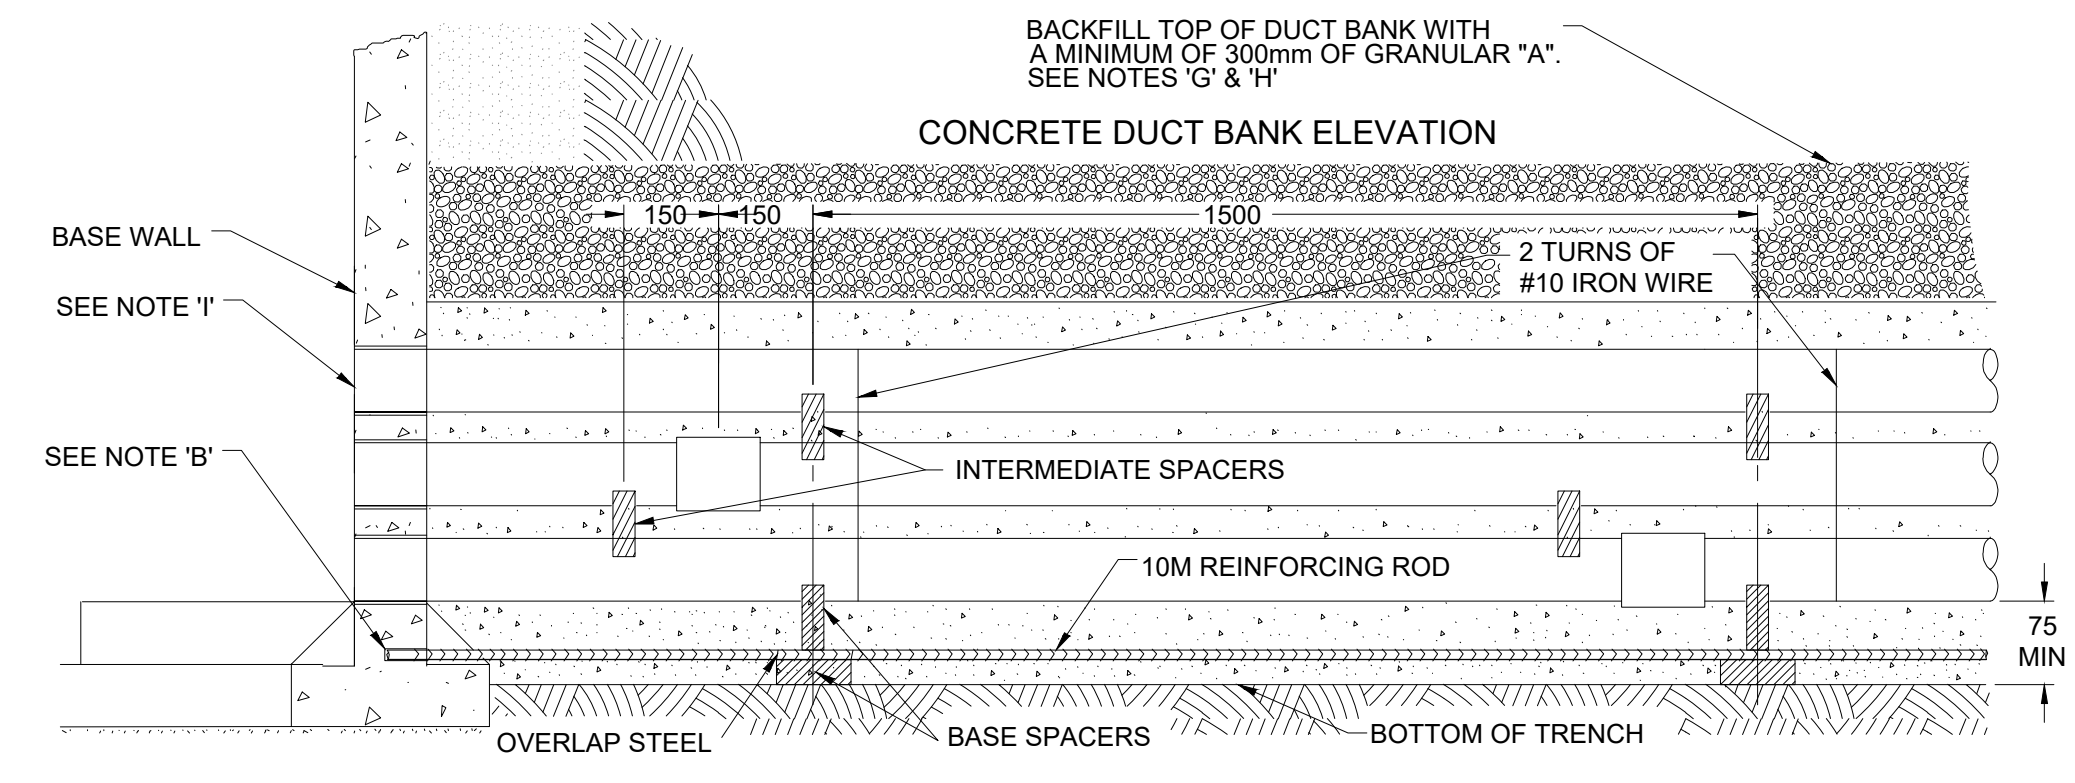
TYPICAL CONCRETE DUCT BANK SECTION VIEW
